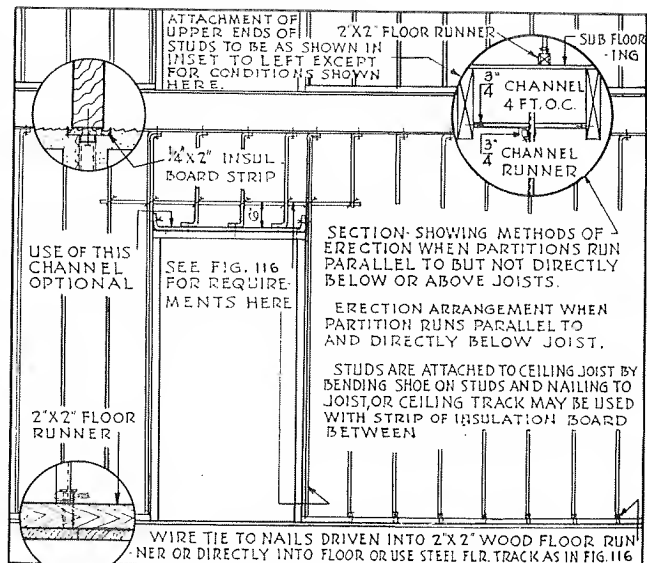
Solid Partitions in Wood-Joisted Building; Ceiling Joists PARALLEL to Partition.
